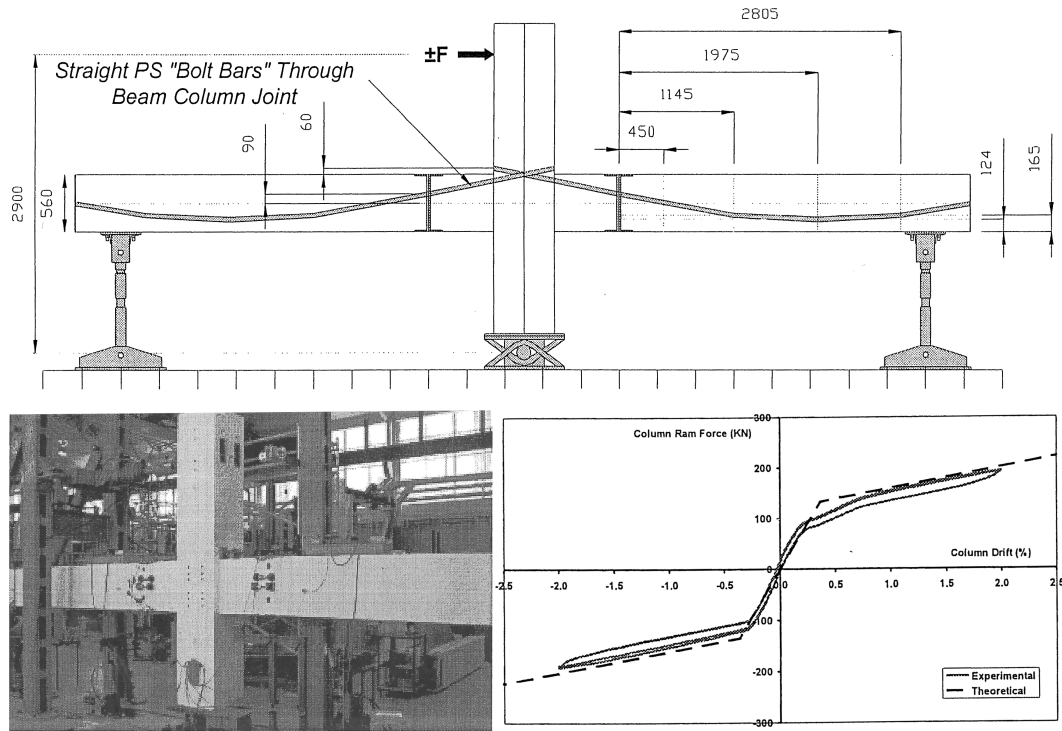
Experimental testing of concrete internal beam-column connection using draped post-tensioning tendons (Arnold, 2004)
